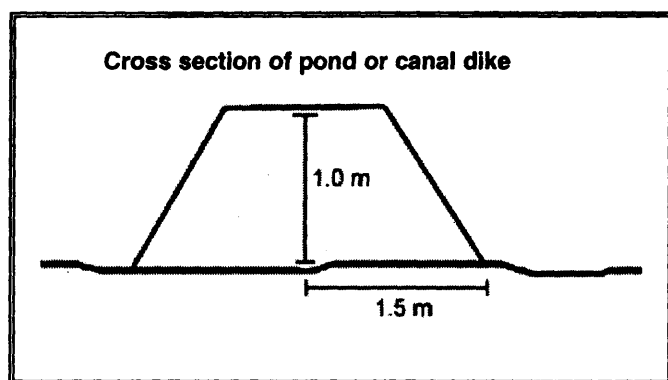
Cross section of a pond or canal dike showing the ratios of the 1.5: 1 slope of the sides of the dike.
